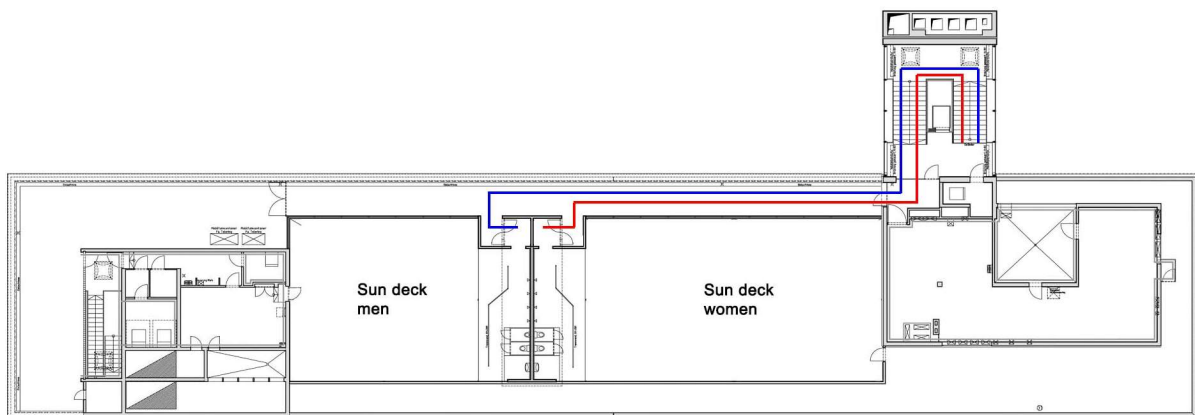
4<sup>th</sup> floor plan Floridsdorfer swimming hall 1:500 (source: MA 44, 2016/17)
